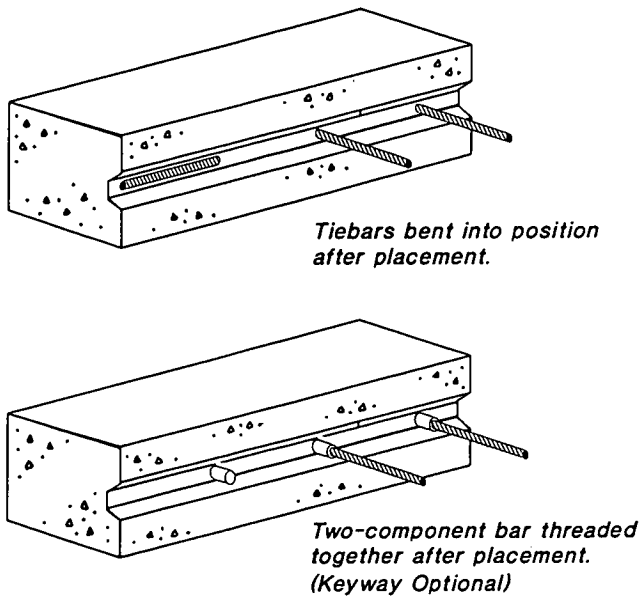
Typical placement of tiebars in fresh concrete (9).
